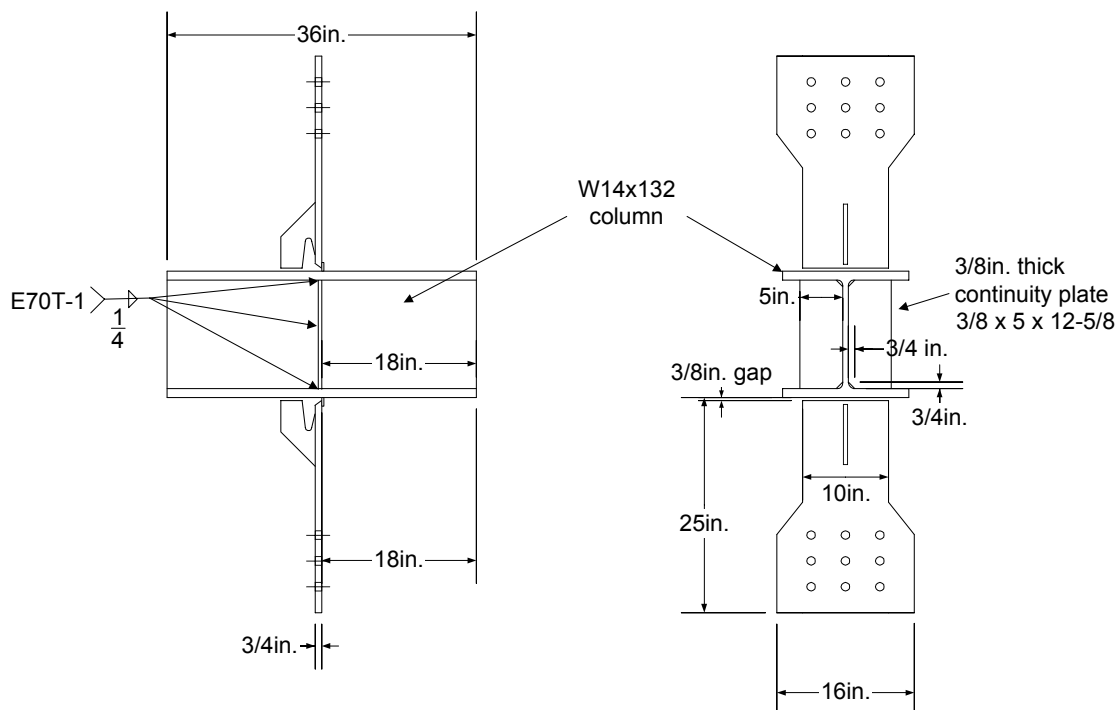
Typical pull-plate specimen with a half-thickness continuity plate, fillet welded to the column flange and web
